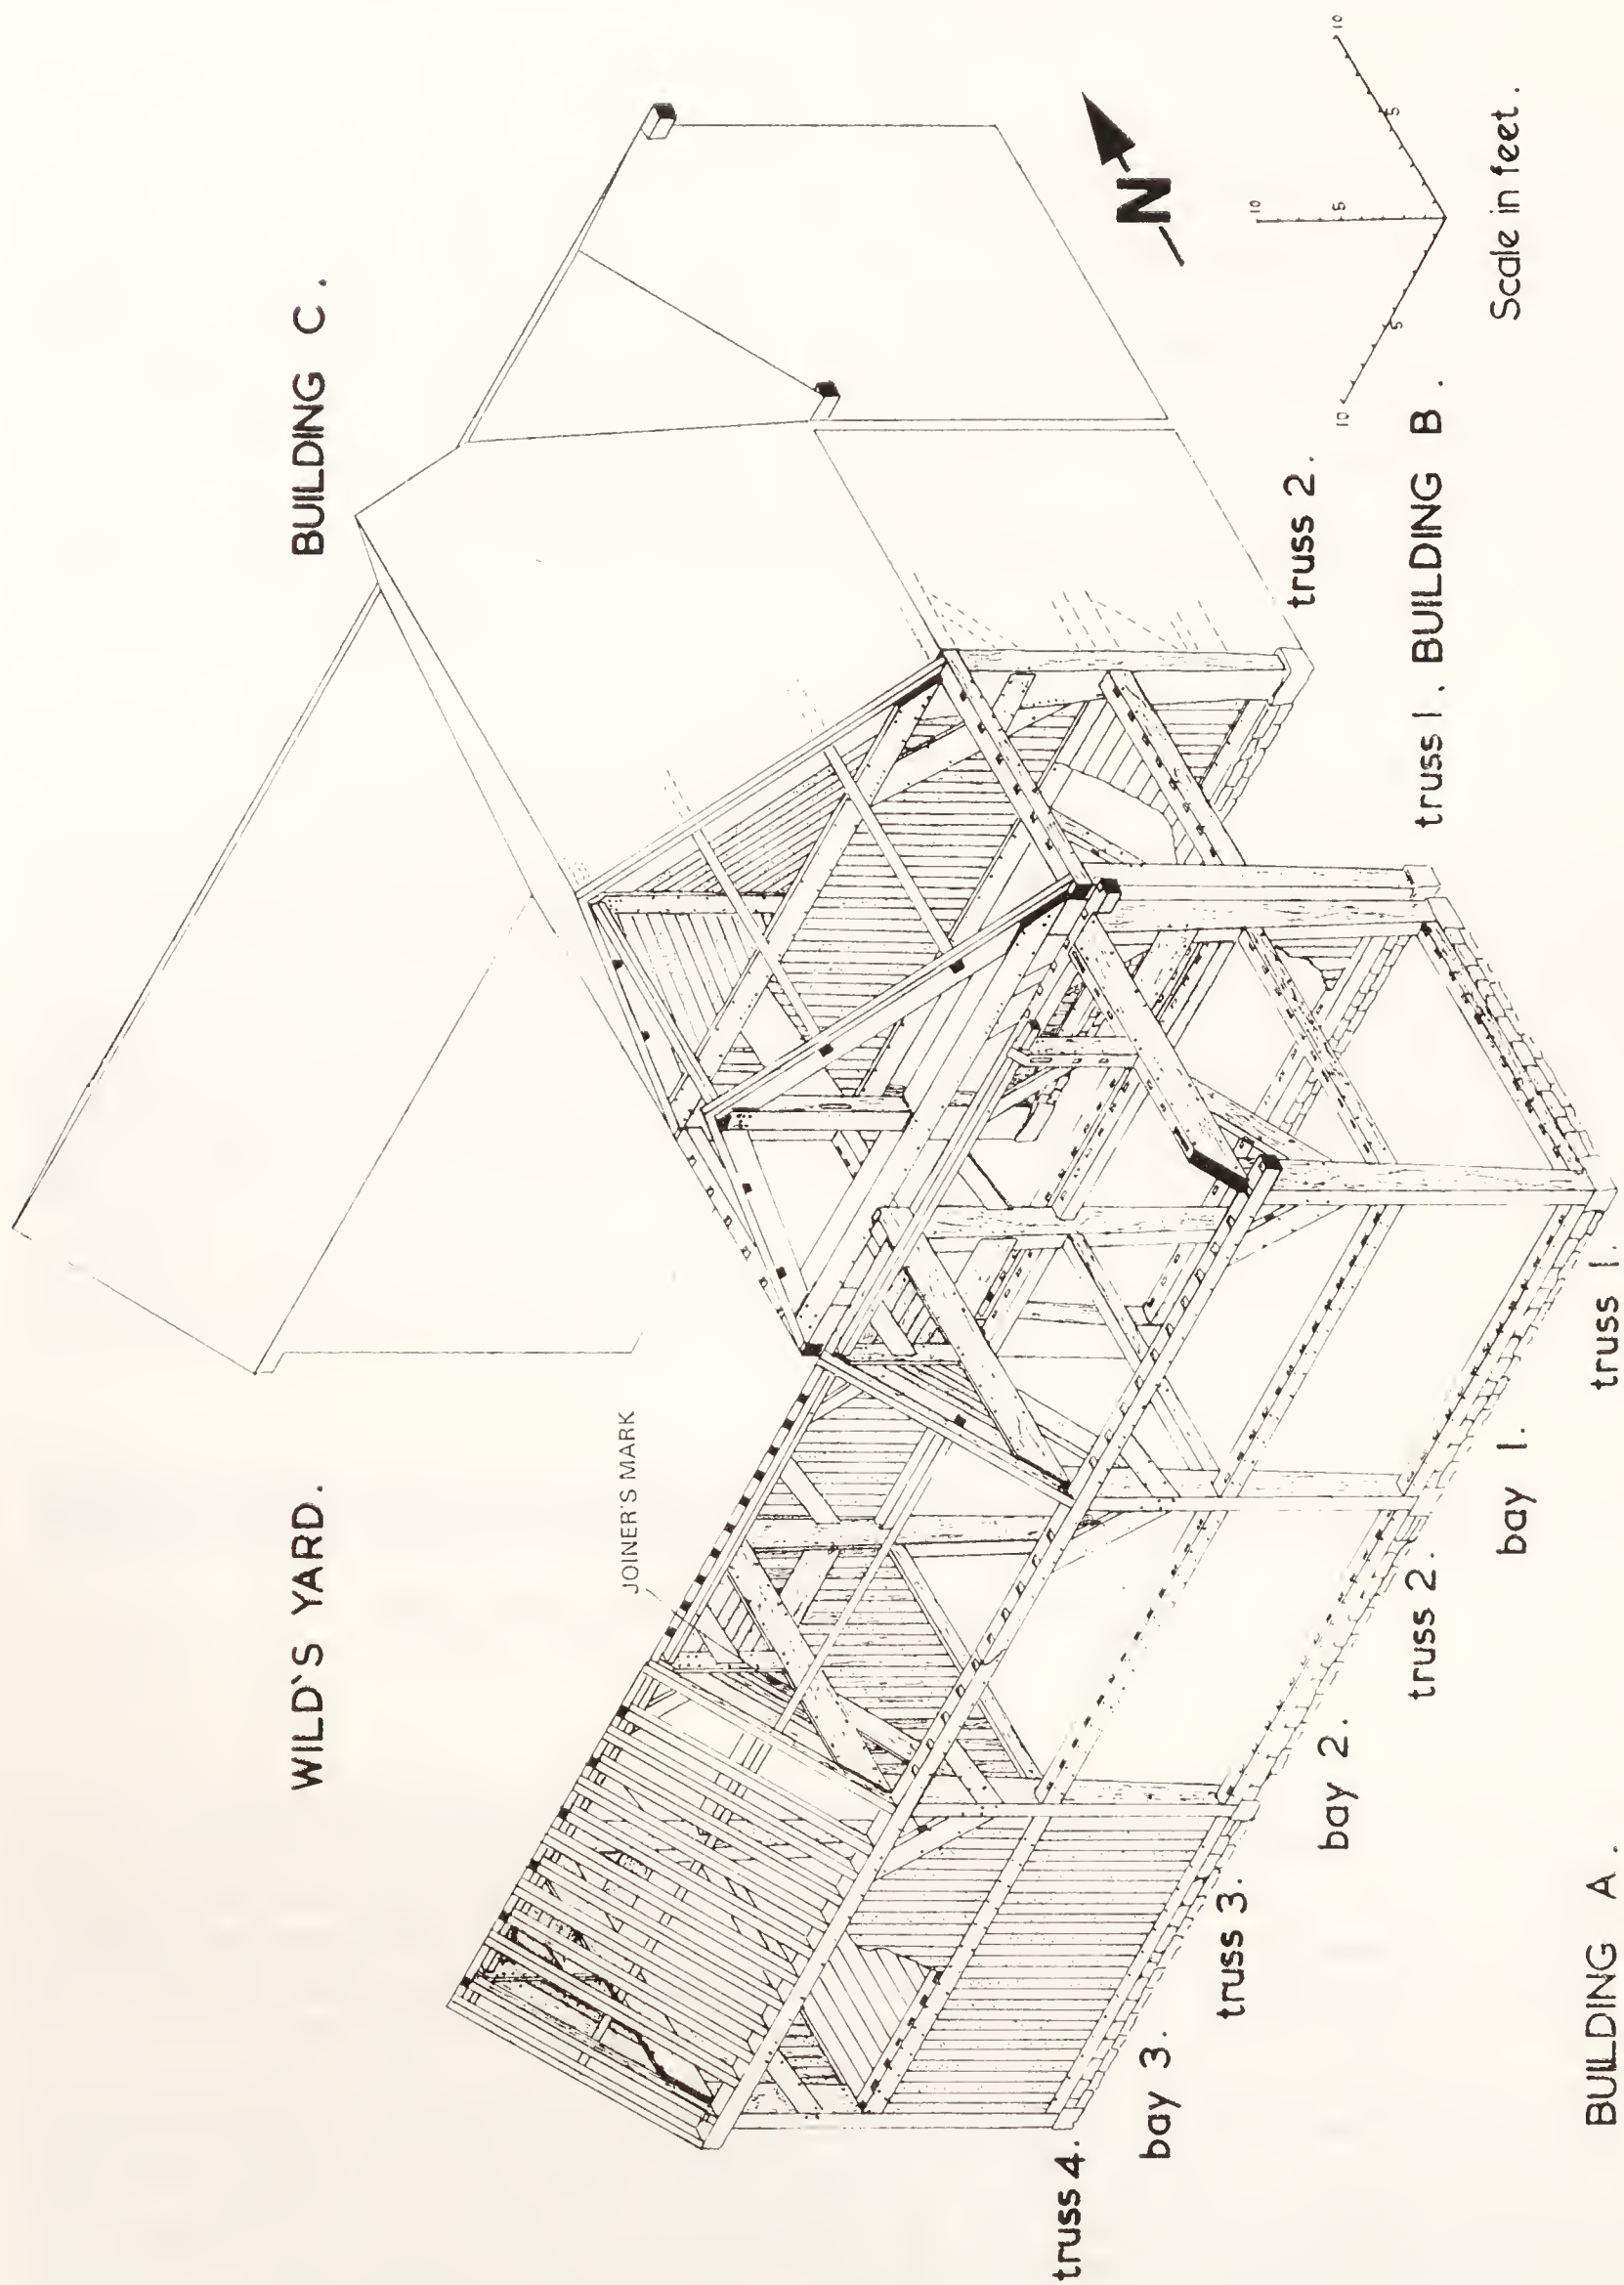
Isometric view of the timber framework of John Bunny's House with studding and floor partially reconstructed.
